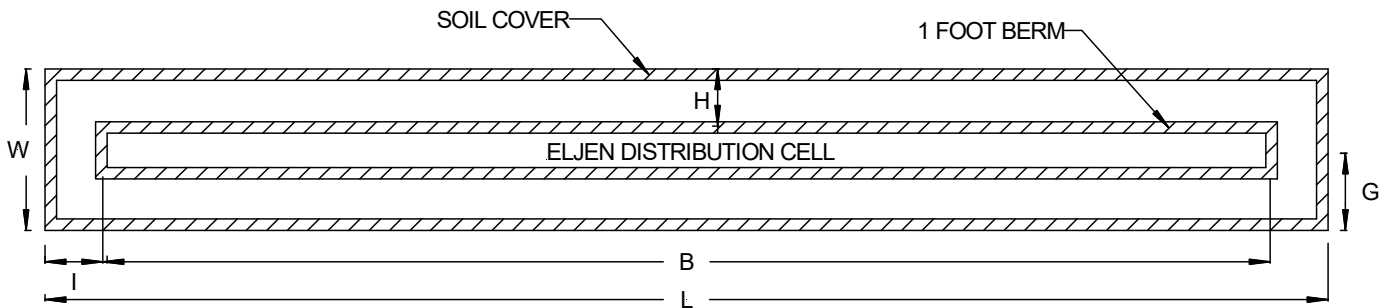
PLAN VIEW – PRESSURE ELEVATED SAND MOUND SYSTEM
